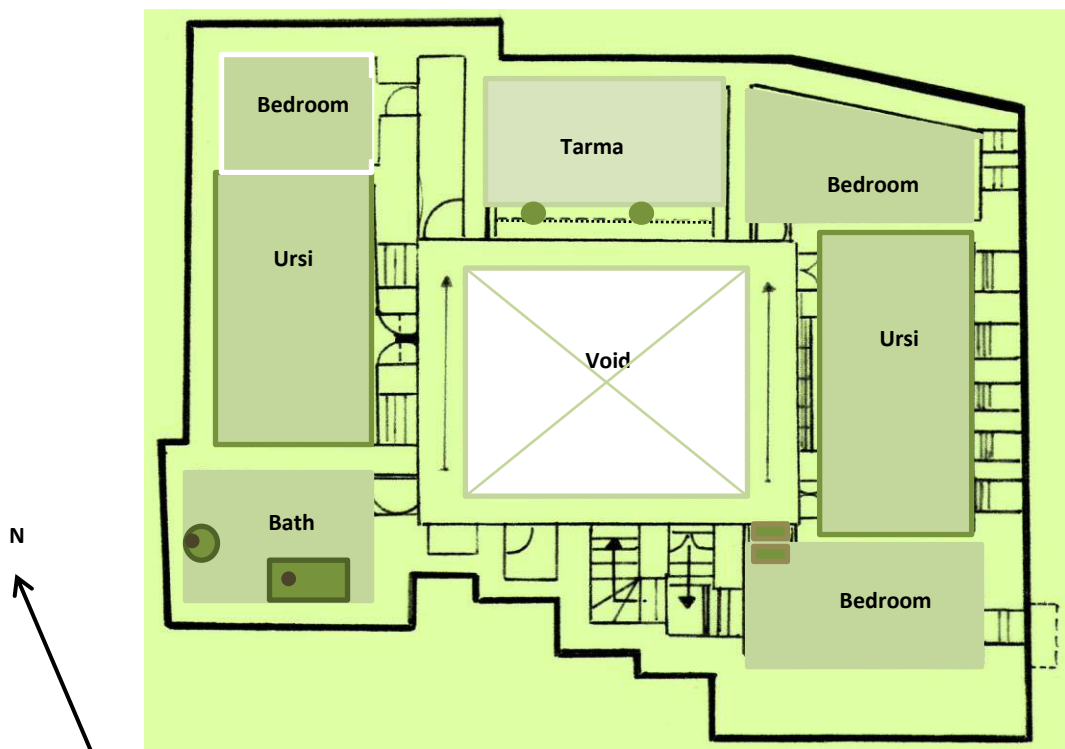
First floor level plan of the traditional courtyard house No. 5. Scale: 1:50
